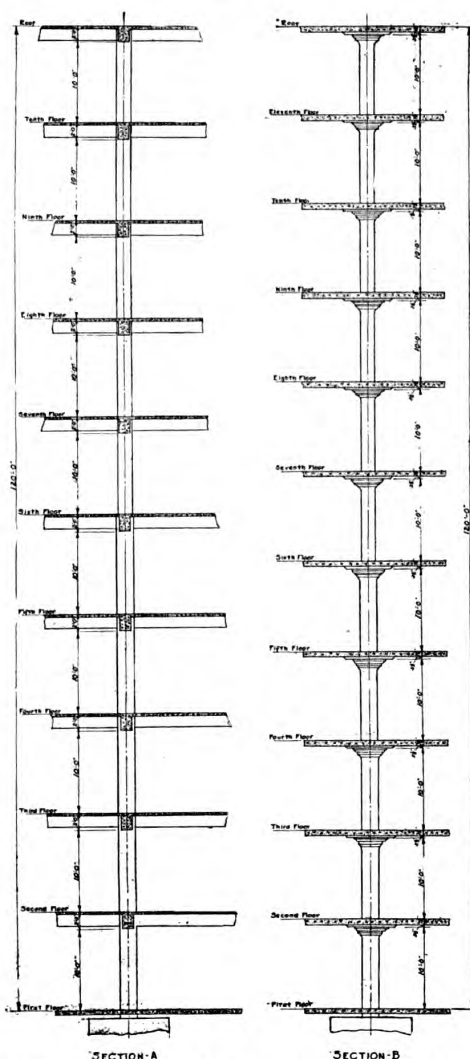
Comparison of Beam and Girder with Flat Slab Construction in Building 120 Feet High
